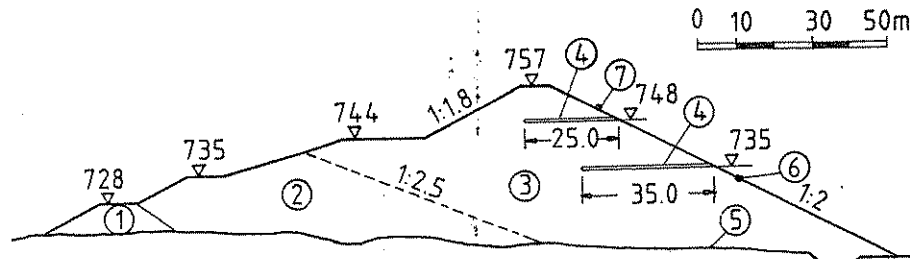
Punchina cofferdam, simplified (elevations m a.s.l., adapted from Villegas 1982).
